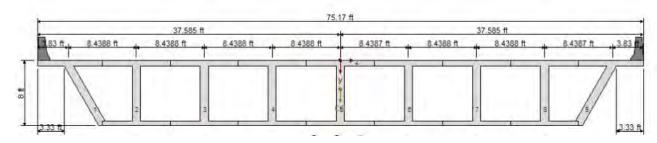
Bridges on SR30 over SR 303 - Typical Section
